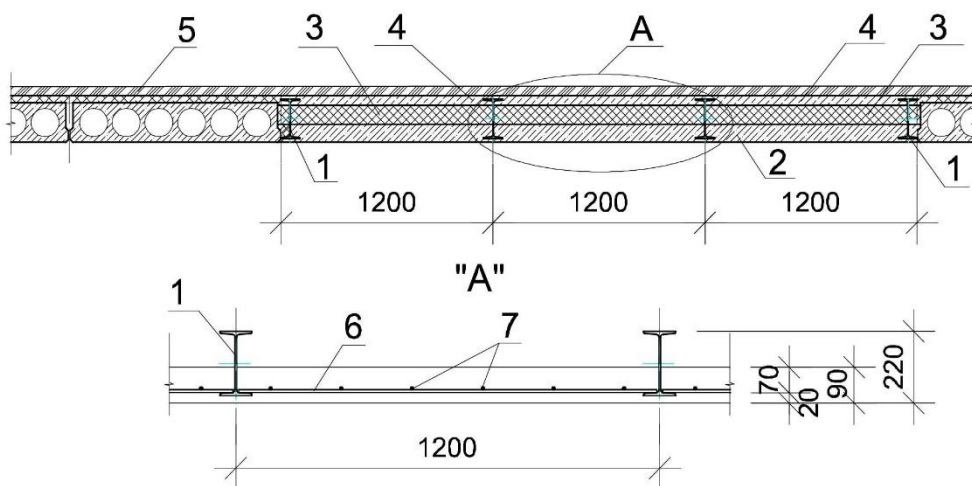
Replacement of the floor from prefabricated reinforced concrete round hollow floor slabs to a monolithic floor on metal beams: 1 – I-beam No. 22; 2 – reinforced concrete monolithic slab (concrete grade C20/25, thickness 90 mm); 3 – extruded polystyrene foam; 4 – finishing screed (thickness 40 mm); 5 – floor design; 6 – reinforcement $\varnothing 8$ mm A400C (spacing 200 mm); 7 – reinforcement $\varnothing 6$ mm A240 (spacing 200 mm)
